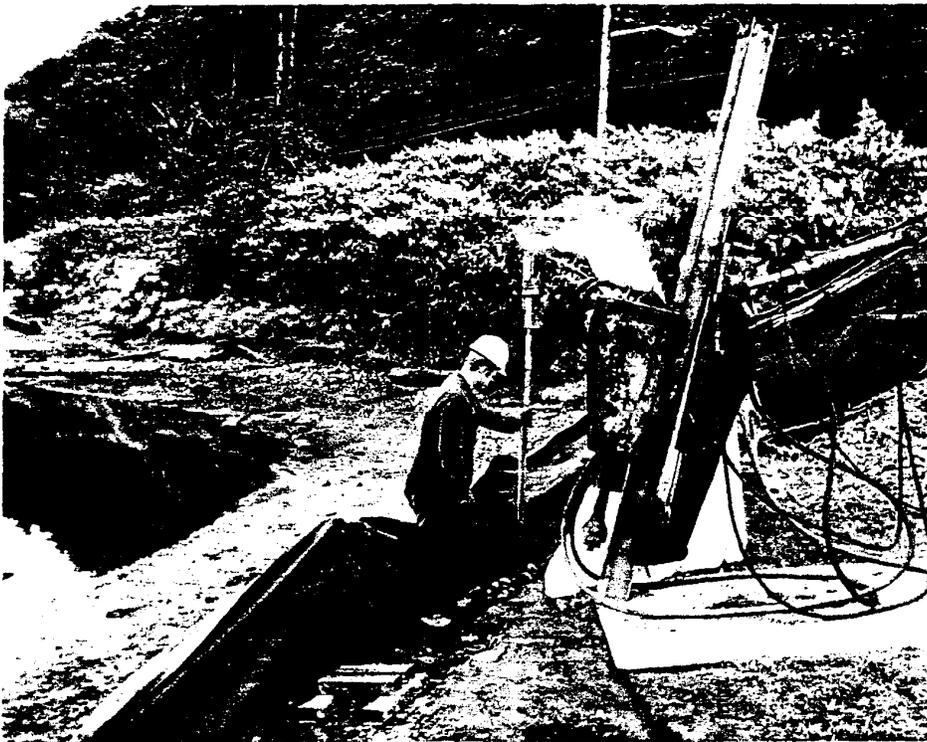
Manta Ray™ Installation at the Squally Beach Site
